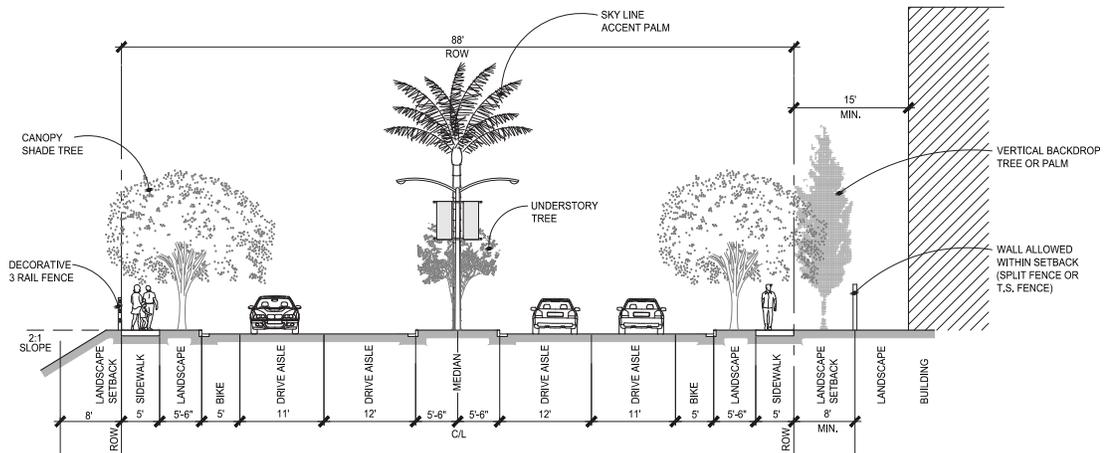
Commerce Way/Taylor Street Cross Section A-A
